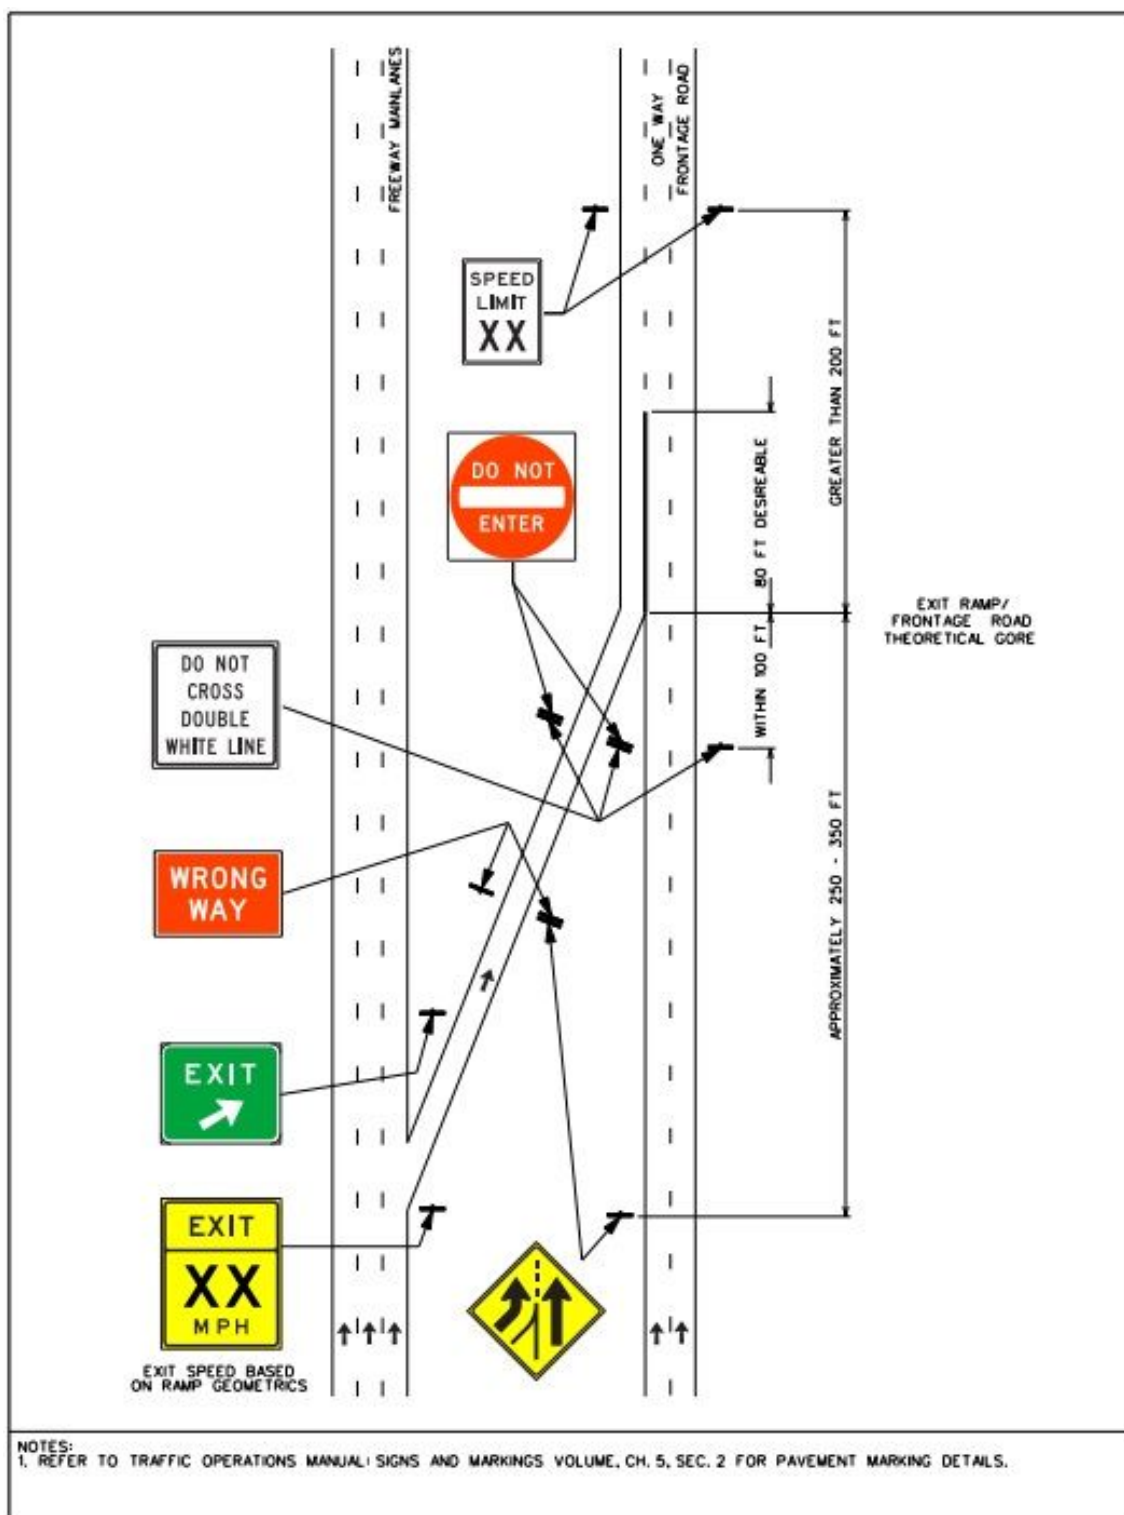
Typical signing for an exit ramp to a one-way frontage road – free lane available.
